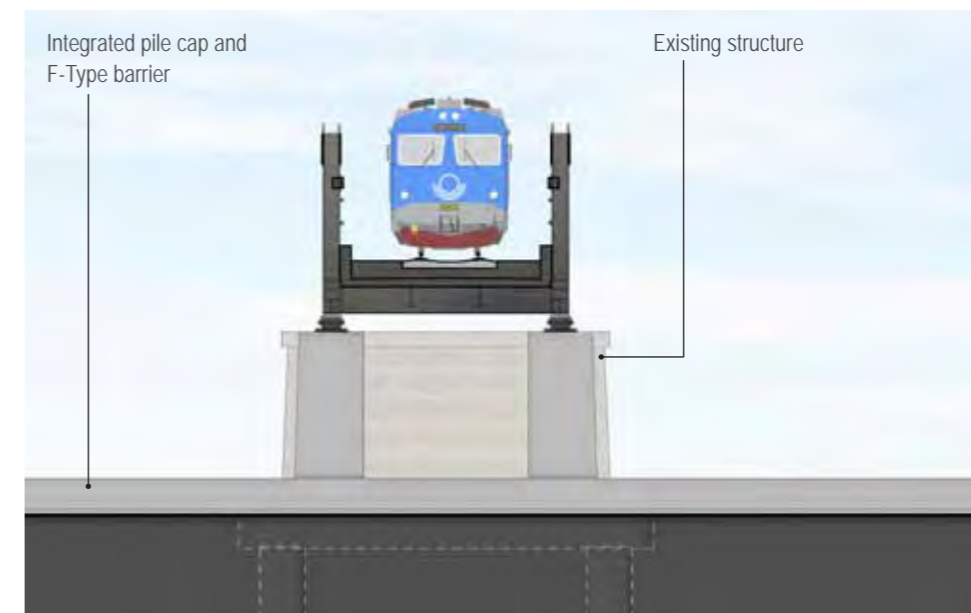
Cross section - Railway Viaduct Replacement at Pound Street (Scale 1:200)
